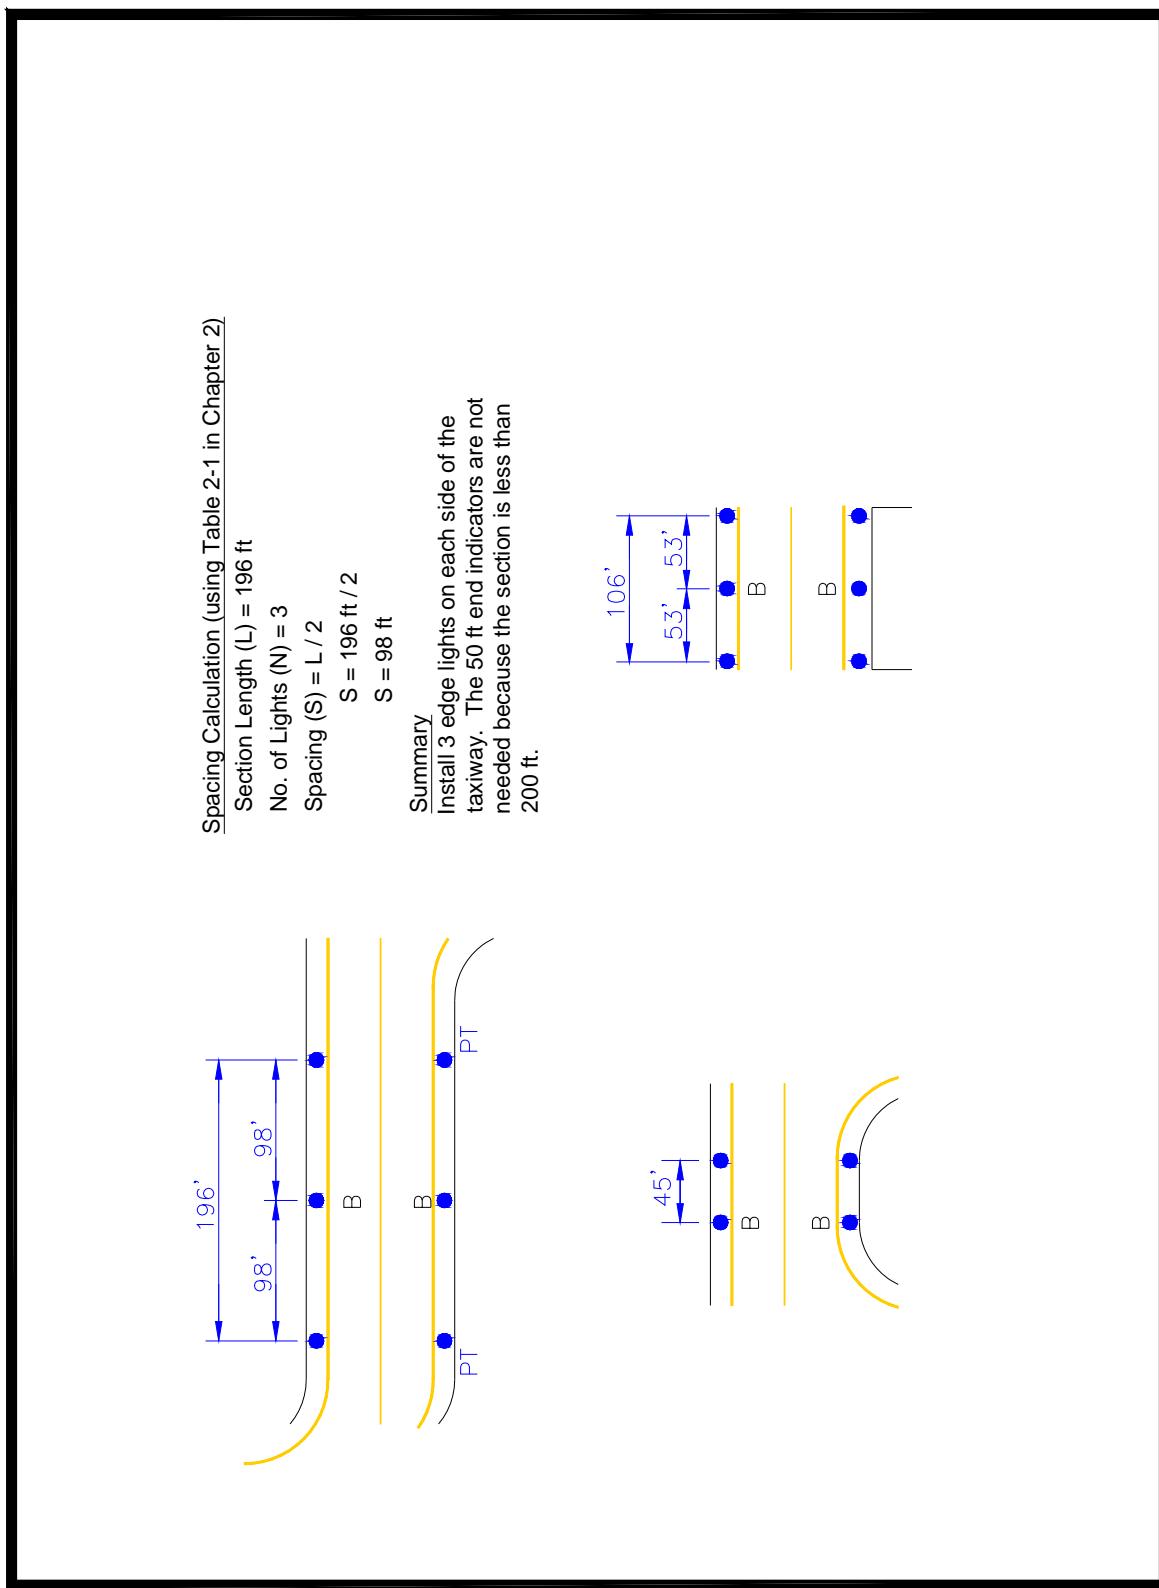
Typical Straight Taxiway Sections (Less Than 200 Feet (61 m)).
